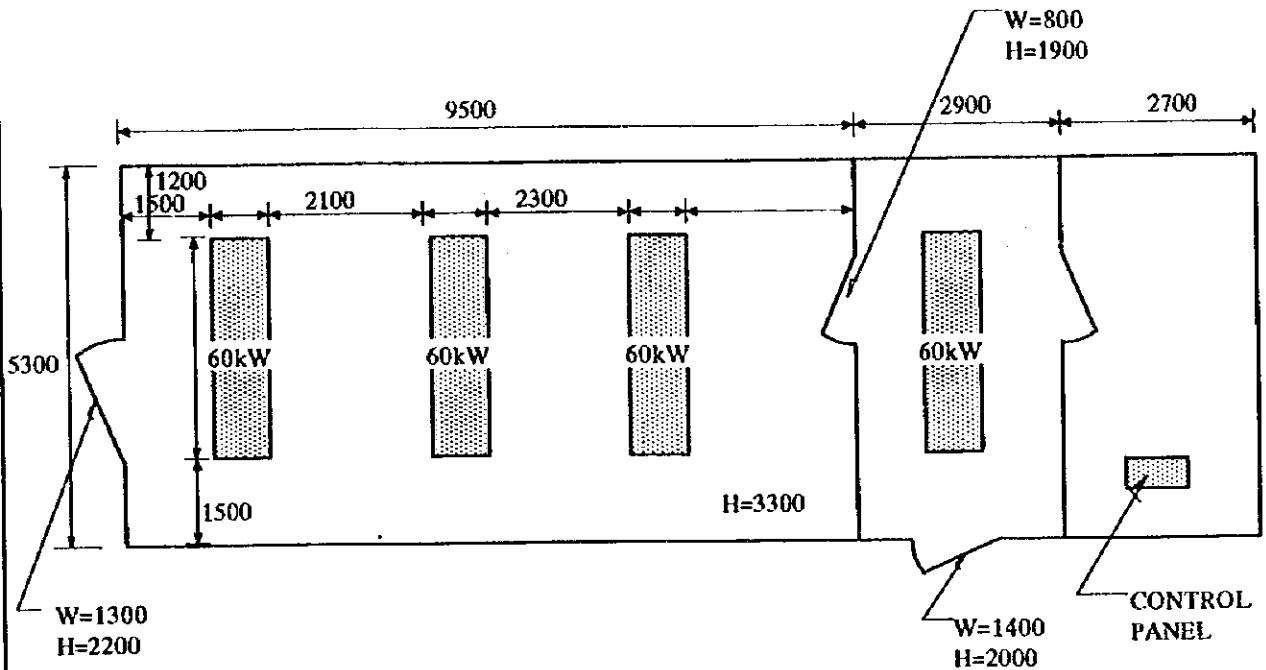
14 Layout Drawing of Bayantsagaan
